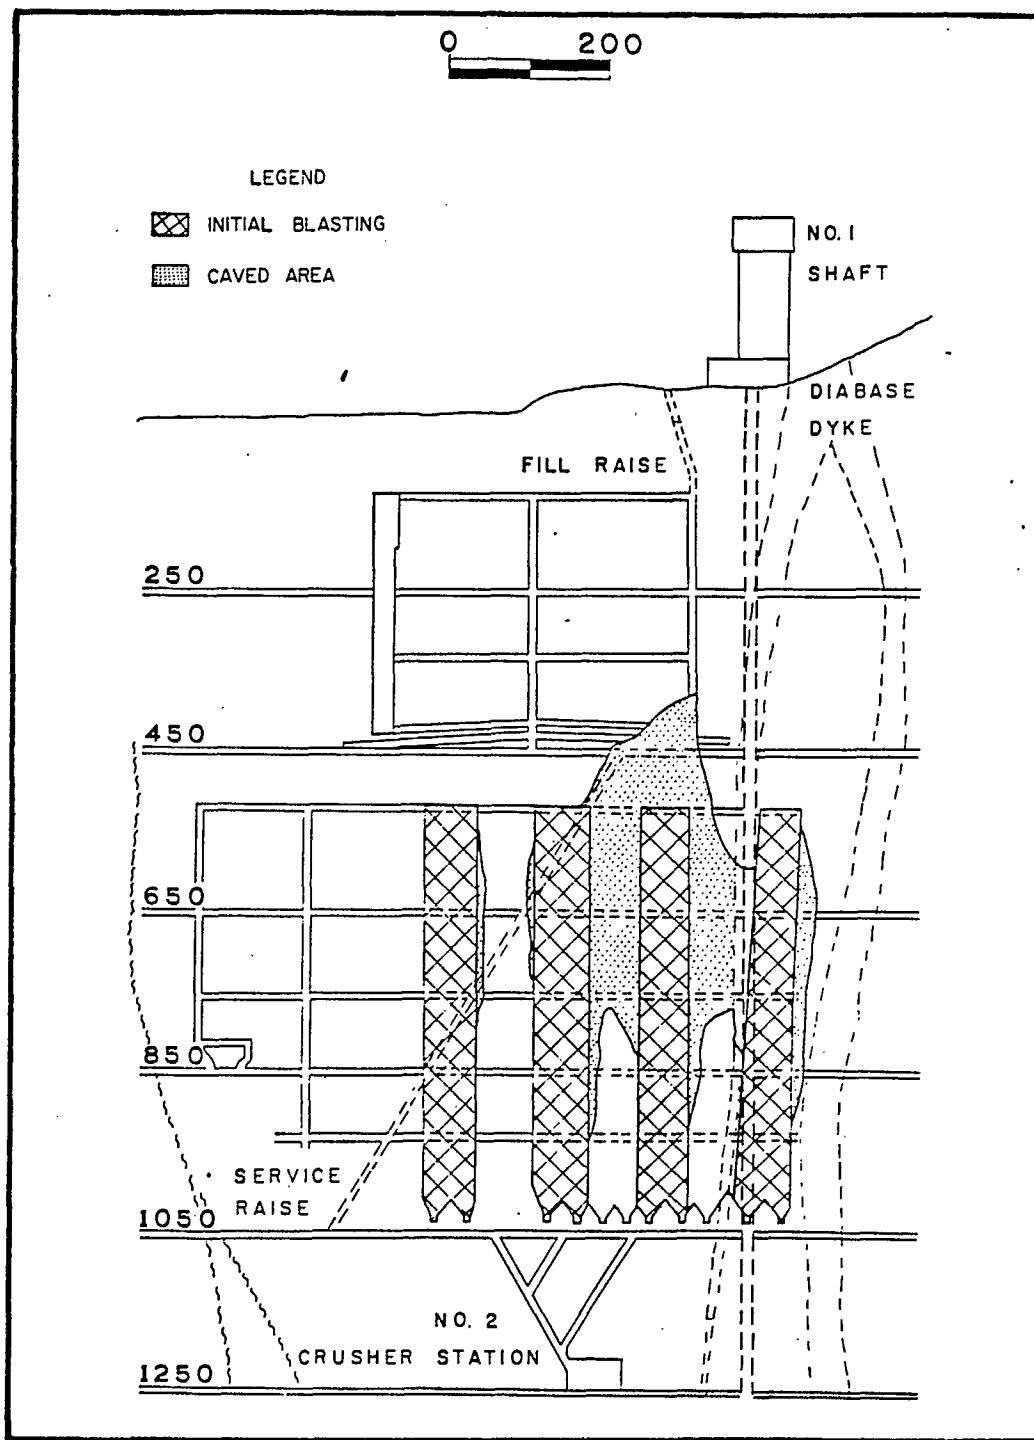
Longitudinal section of blasthole stoping, with pillar collapse.
